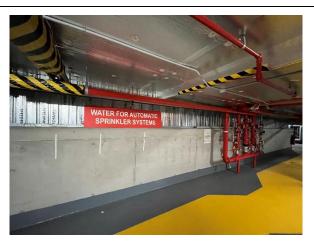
Mezzanine Level, Plant Room, Sprinkler Tank 120kL
